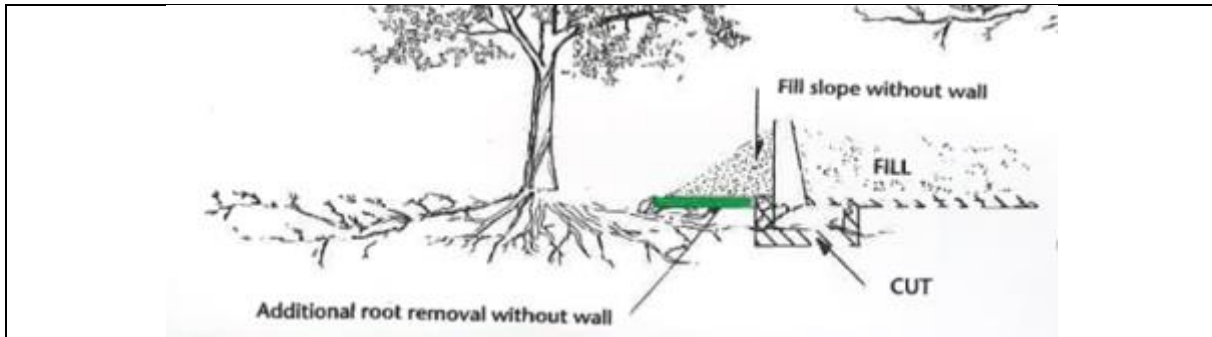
Image B: An image from A technical guide to preservation of trees during land development ,⁹ showing how retaining walls can be used to limit fill inside the TPZ.
